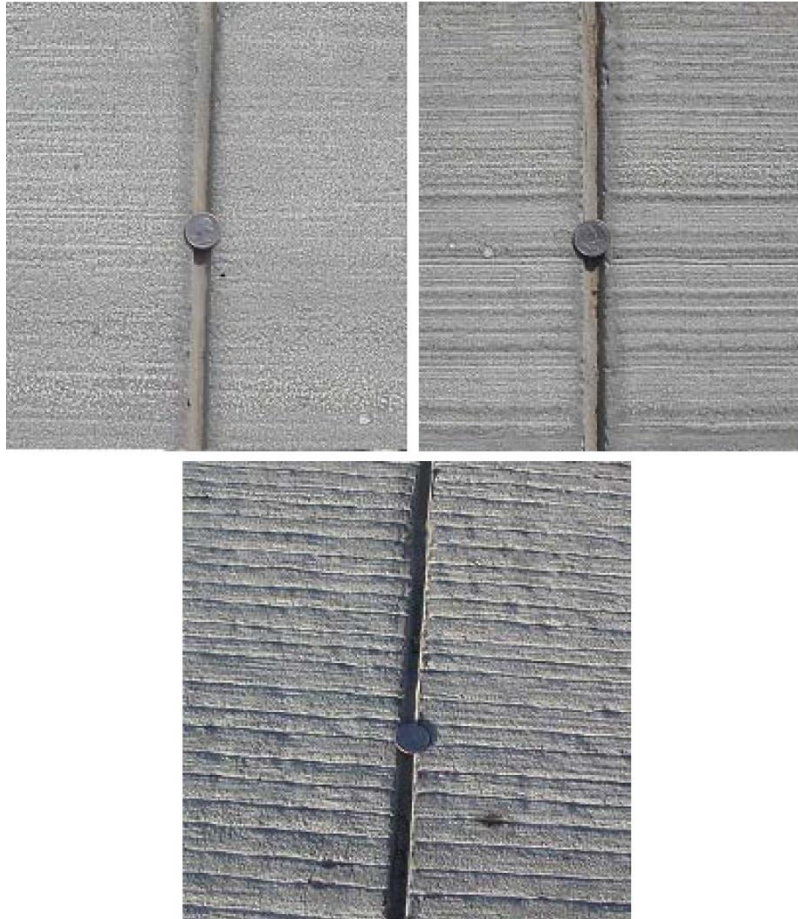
Typical pavement joints for Mohave Bypass sections
